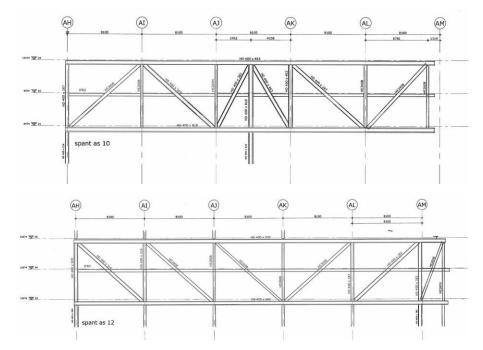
Trusses used for the new Delft train station and City Hall: a) truss with overhang on 1st/2nd floor, b) truss with wide span on 3rd/4th floor
